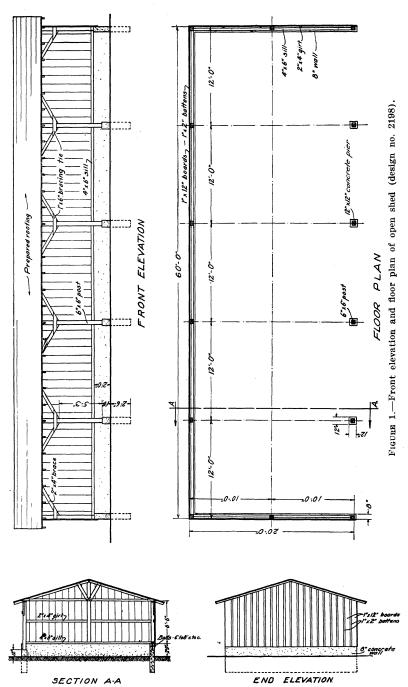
Cross section and end elevation of open shed (design no. 2198).
